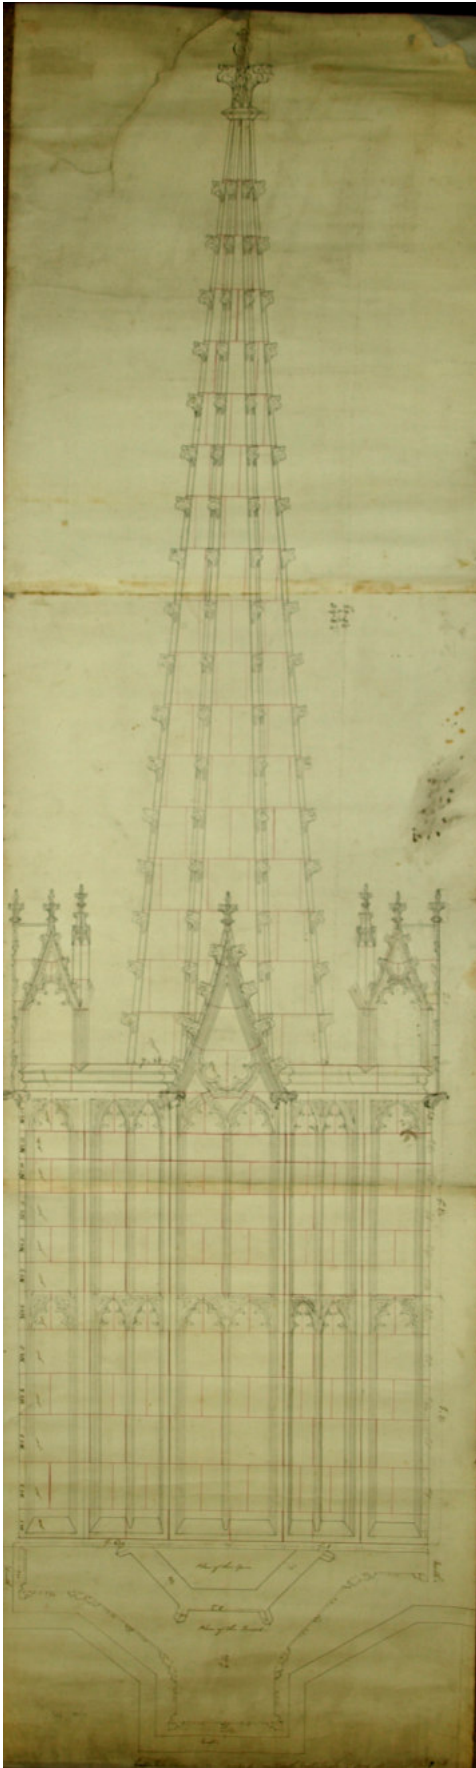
East Front, south-east turret elevation and section with detail, 1837-1838 (YML/3/10)
